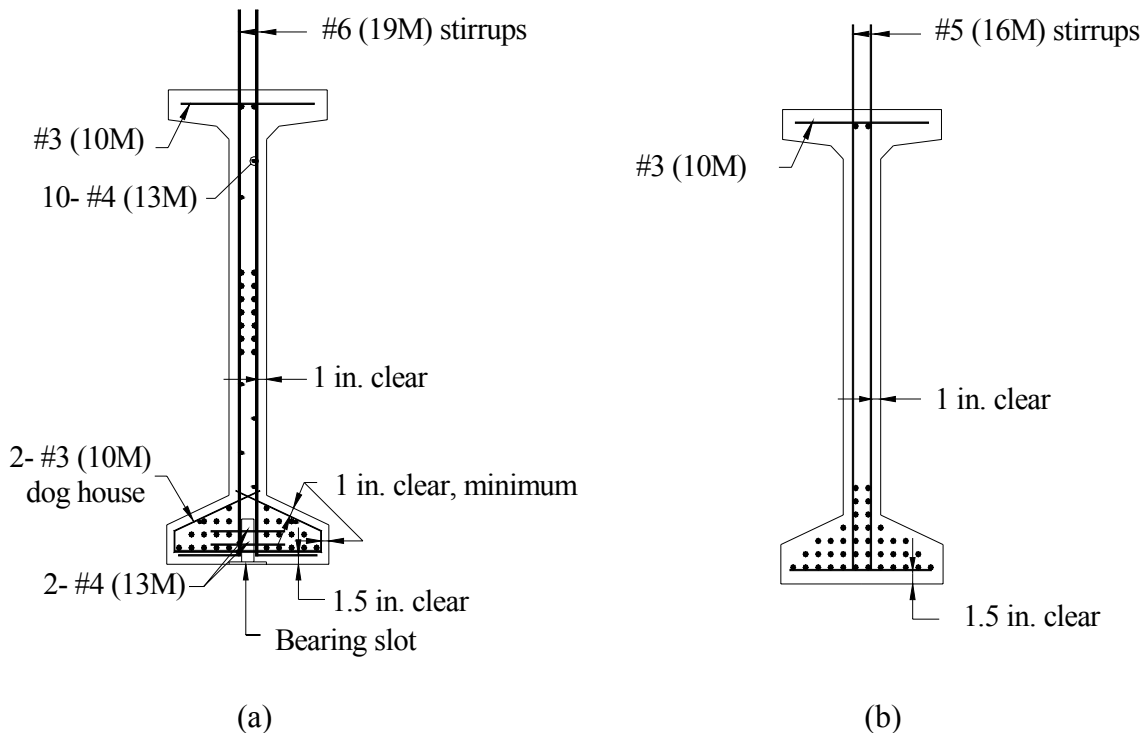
Reinforcement detail of SCC girders (a) at ends, and (b) at center
